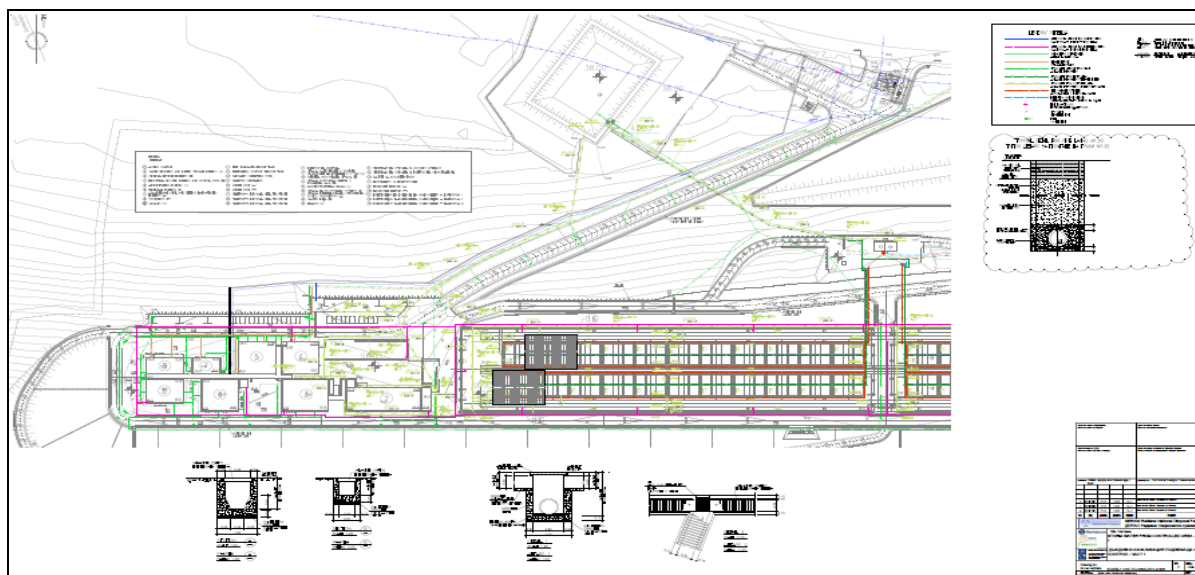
SITE SEWERAGE OF THE NDF AND RAIN DRAINS DETAILS FOR TRENCH TYPE REPOSITORY
